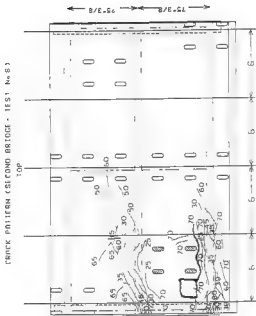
Top Cracking Pattern (Second Bridge - Test No 6)
